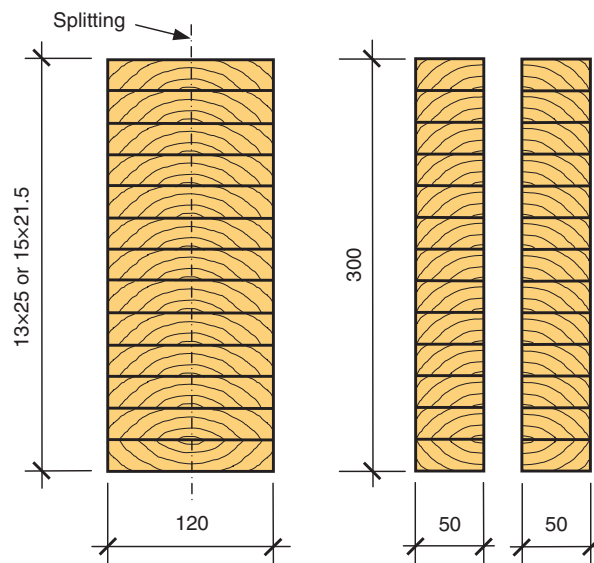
Wet-glued beams before (left) and after (right) splitting, drying and planing
